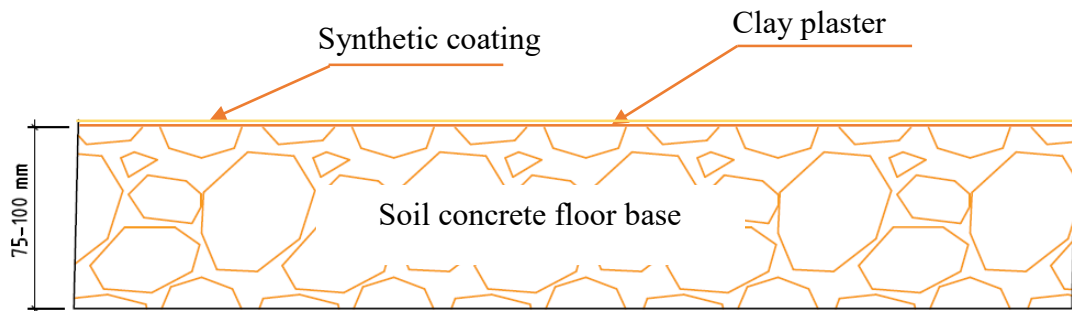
Symmetric diagram of soil concrete flooring system
